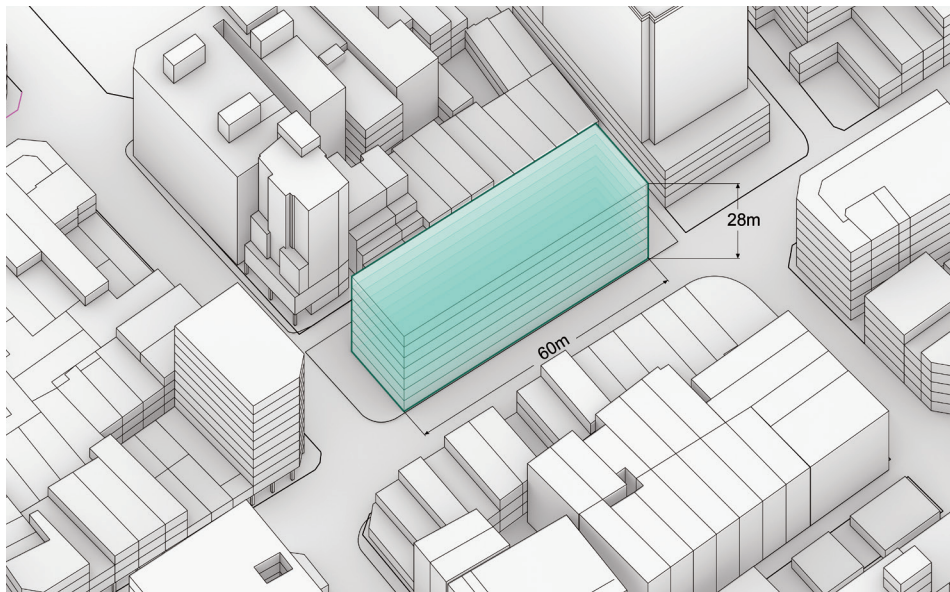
After applying set-back measures and calculating the building coverage ratio, a building massing that uses the entire buildable ground floor area can be constructed 7 storeys tall and 28 metres high.
